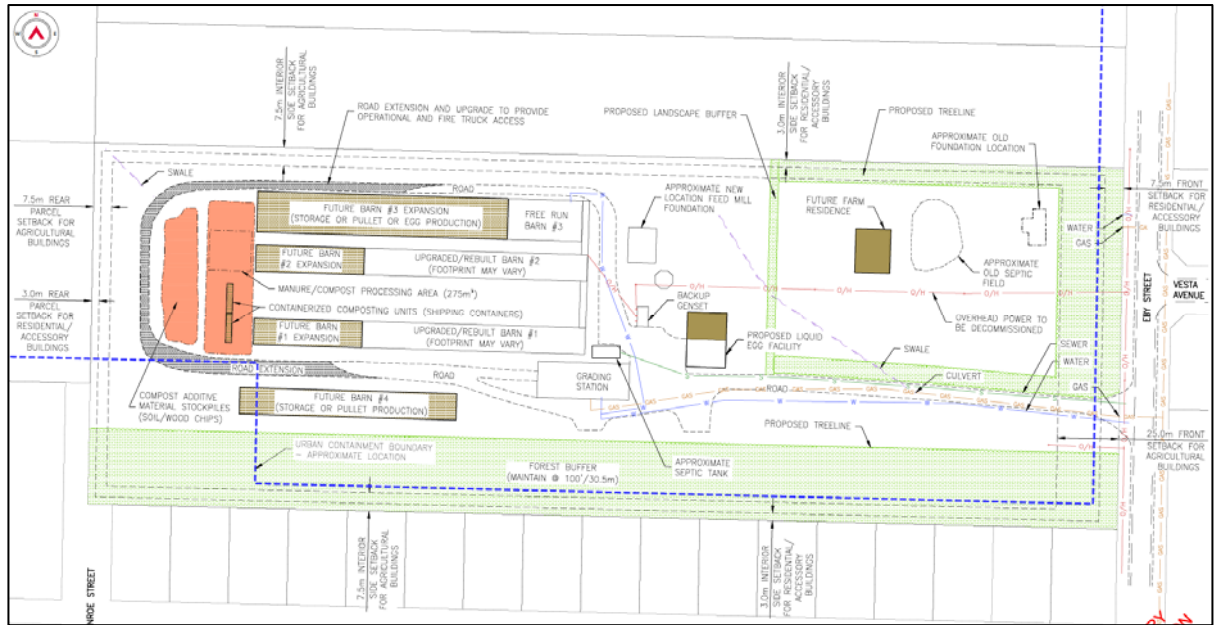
Proposed Upgrades Layout (See Appendix A for full size drawings)
